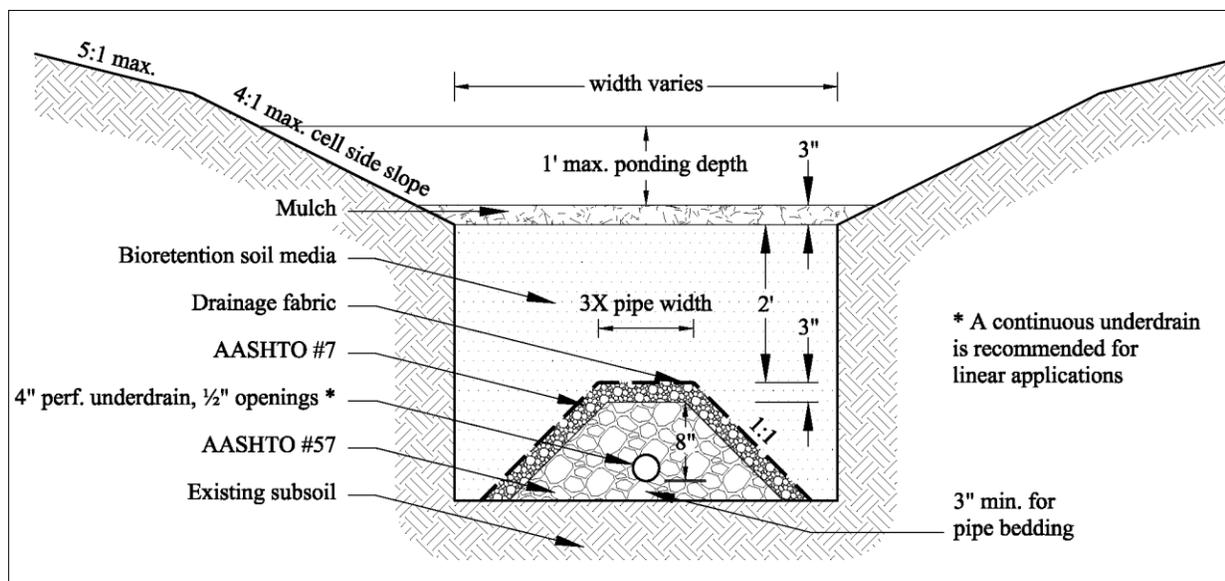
Typical bioretention cross section (not to scale) (NCHRP 2006).
